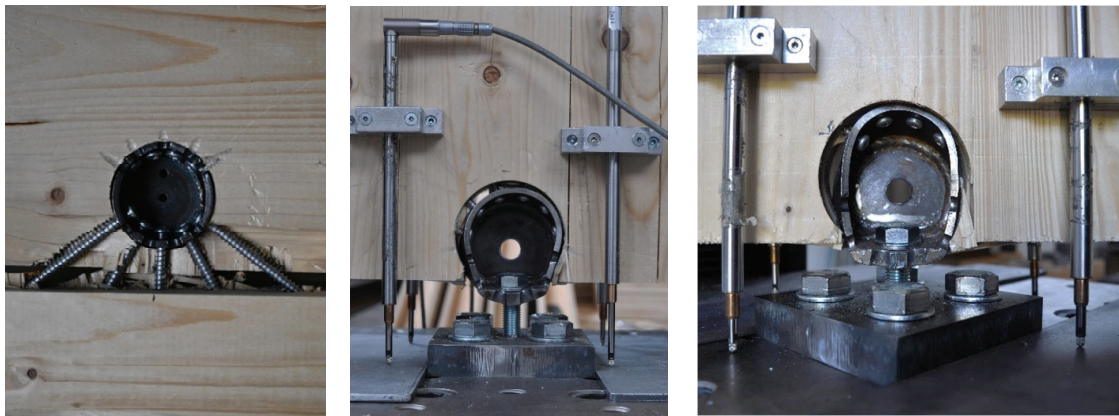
FIT failure modes: RING60T (left), RING90C screws withdrawal (centre) and RING90C screw tensile failure (right)
